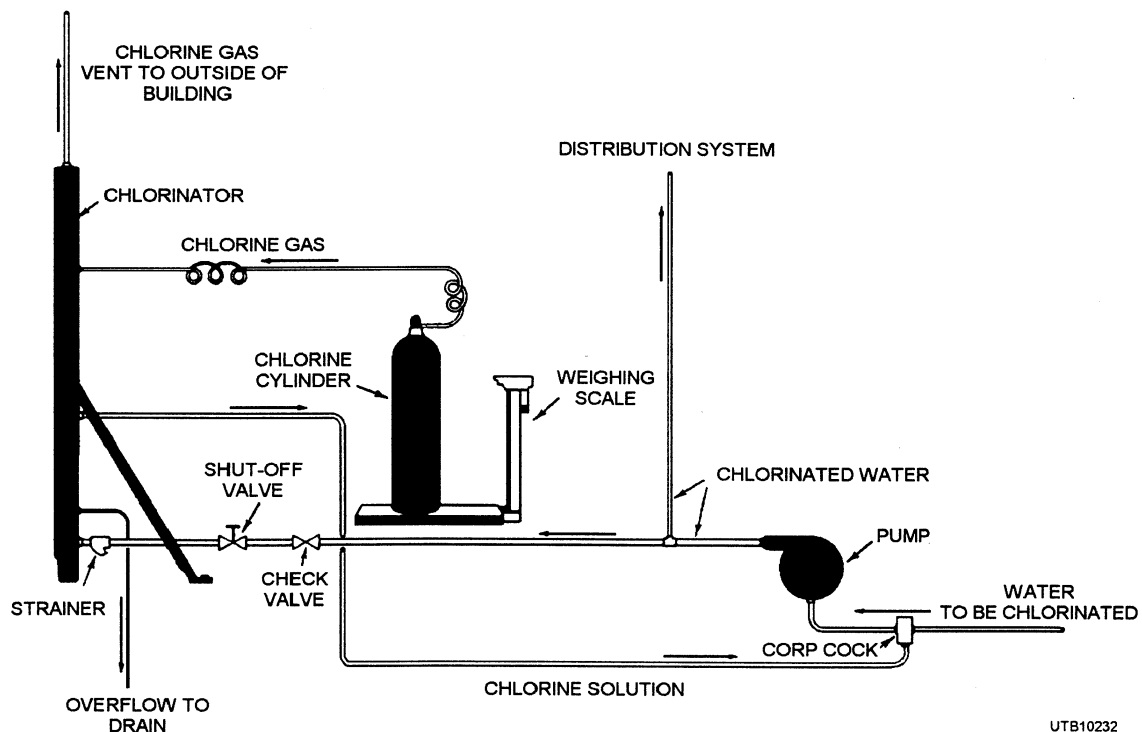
Typical gas chlorination equipment piping diagram.
